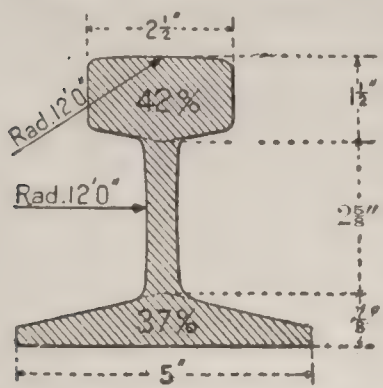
Flanged T section rail—80 lbs. per linear yard. Standard Am. Soc. Civil Engineers.
